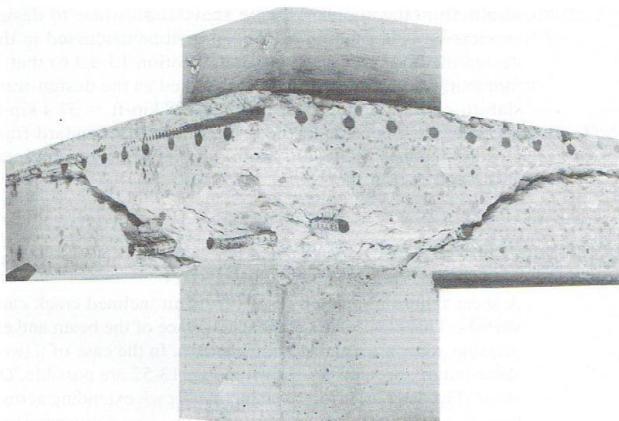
Shear failure with inclined cracks (photo courtesy of J.G. Mac Gregor)
